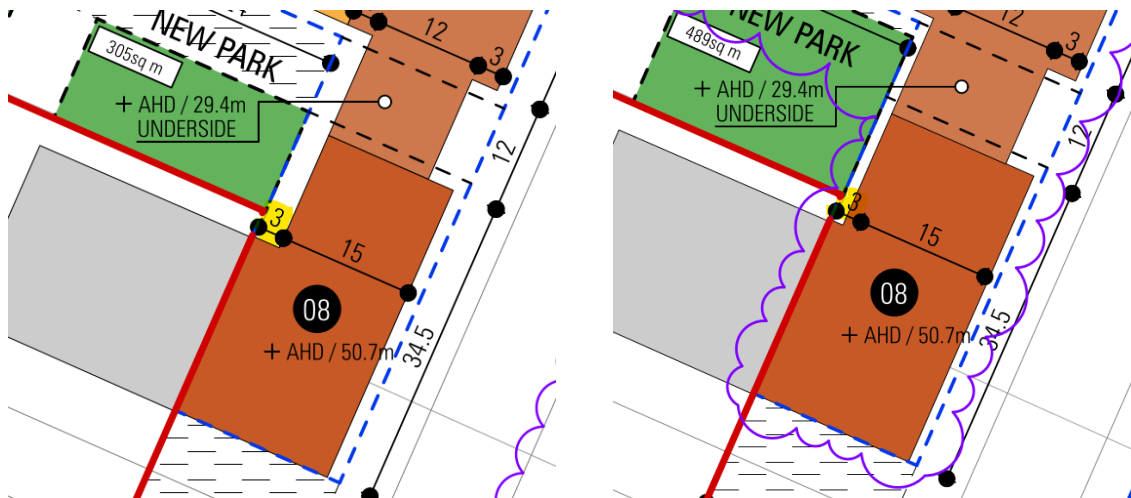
Approved Building H envelope (left) compared to the proposed Building H envelope (right), with a reduction of the 3m western setback proposed
